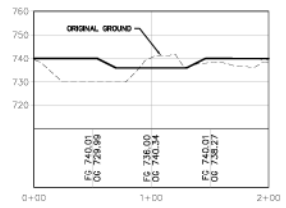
, PROPOSED MINING PLAN RECLAMATION PLAN AMENDMENT 22-0001
